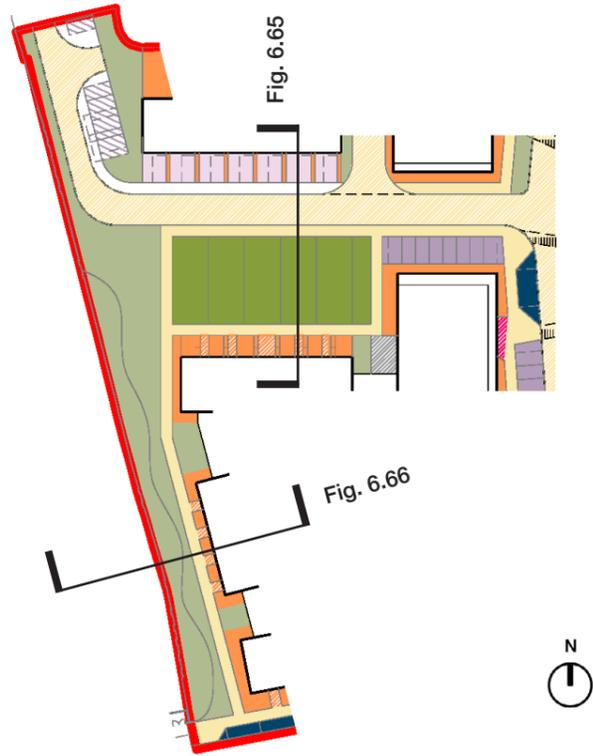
Coding plan - stitching around Fordham Gardens - Plots A and P.
